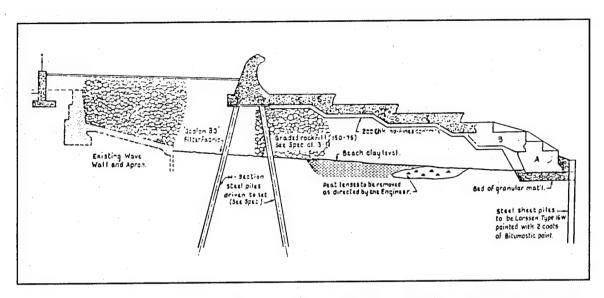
Cross section of sea-defense, coastal-protection structure at Newbiggin-by-the-Sea (from Barfoot 1988)
